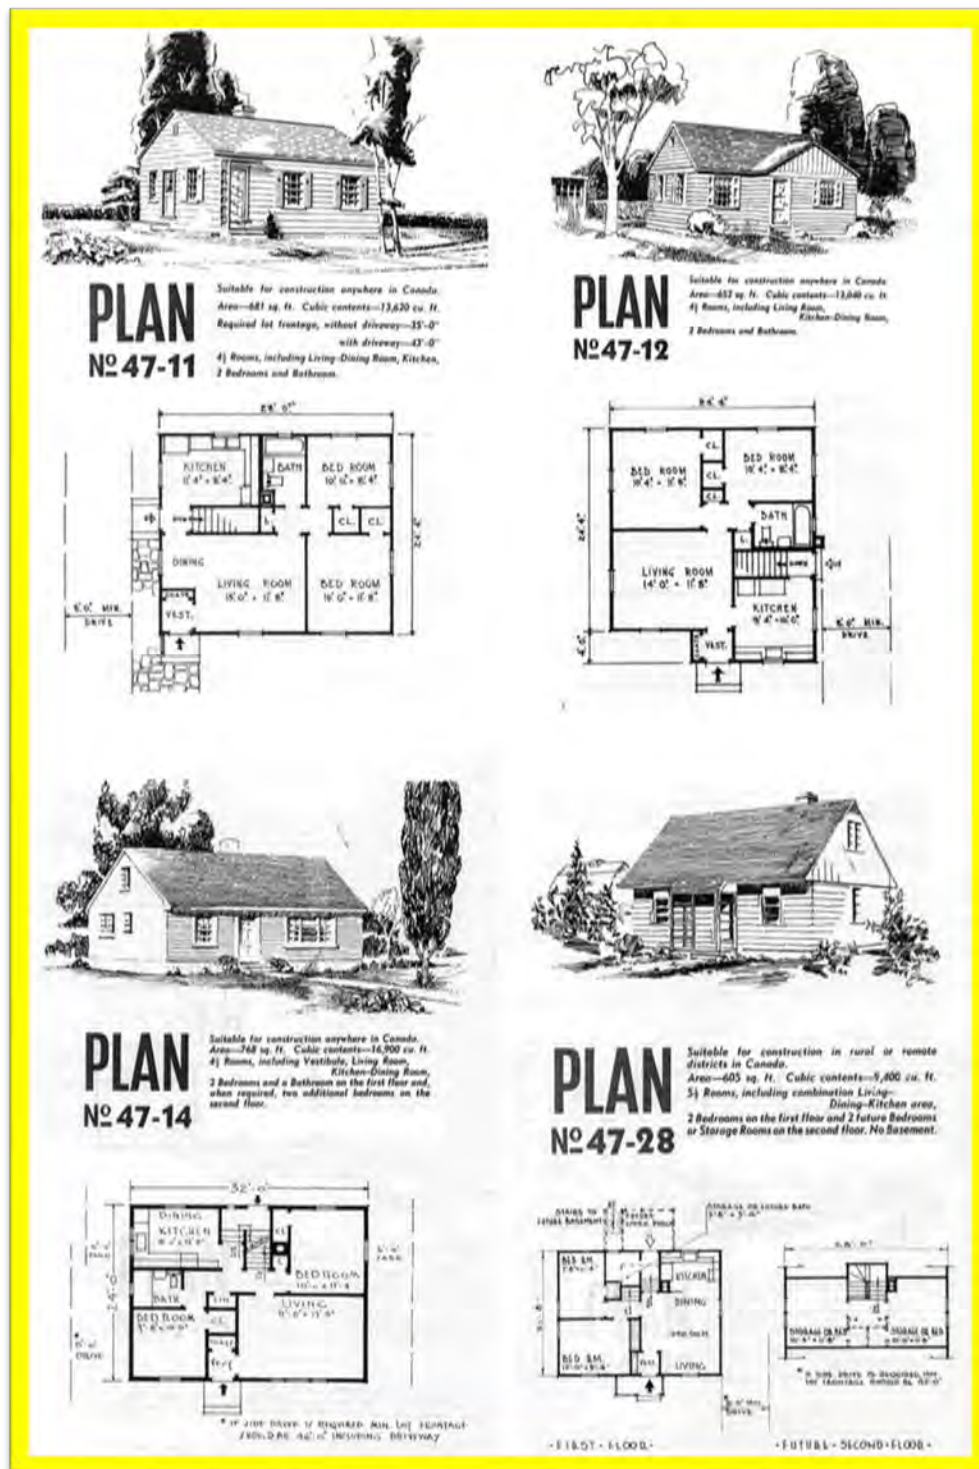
Renderings and floor plans for some standard post-war dwellings published by CMHC in 1947: “67 Homes for Canadians”, some with basements and some without (e.g. Plan 47-28 specifies no basement). These houses are similar in size and design to the wartime dwellings shown above.
